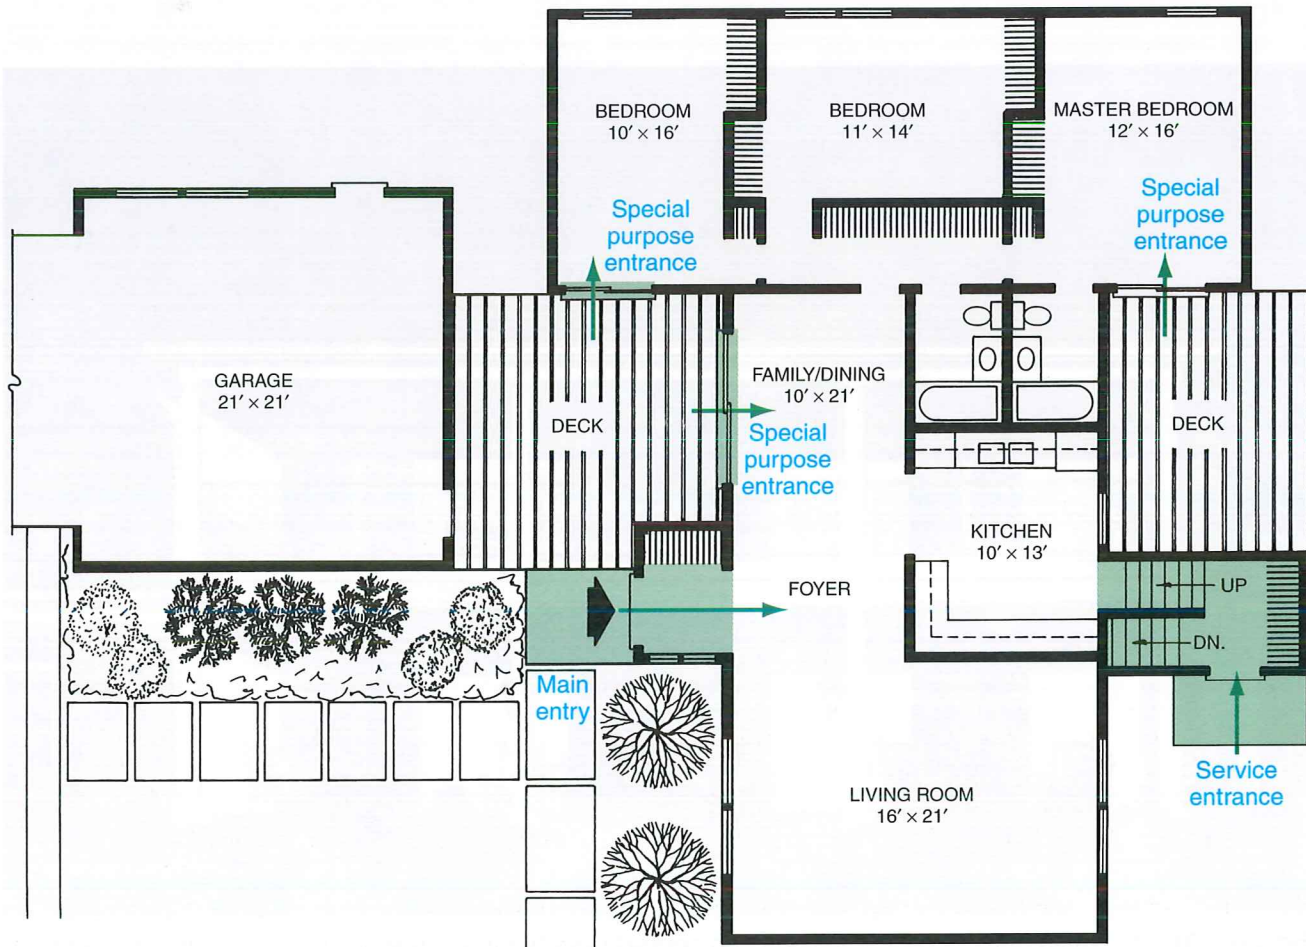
This floor plan illustrates a variety of entryways. Note the main entry and foyer.
